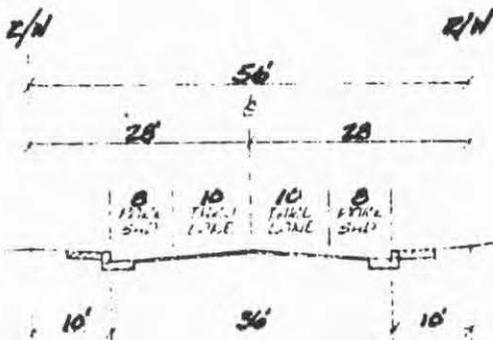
STREET STANDARDS, CROSS-SECTIONS
